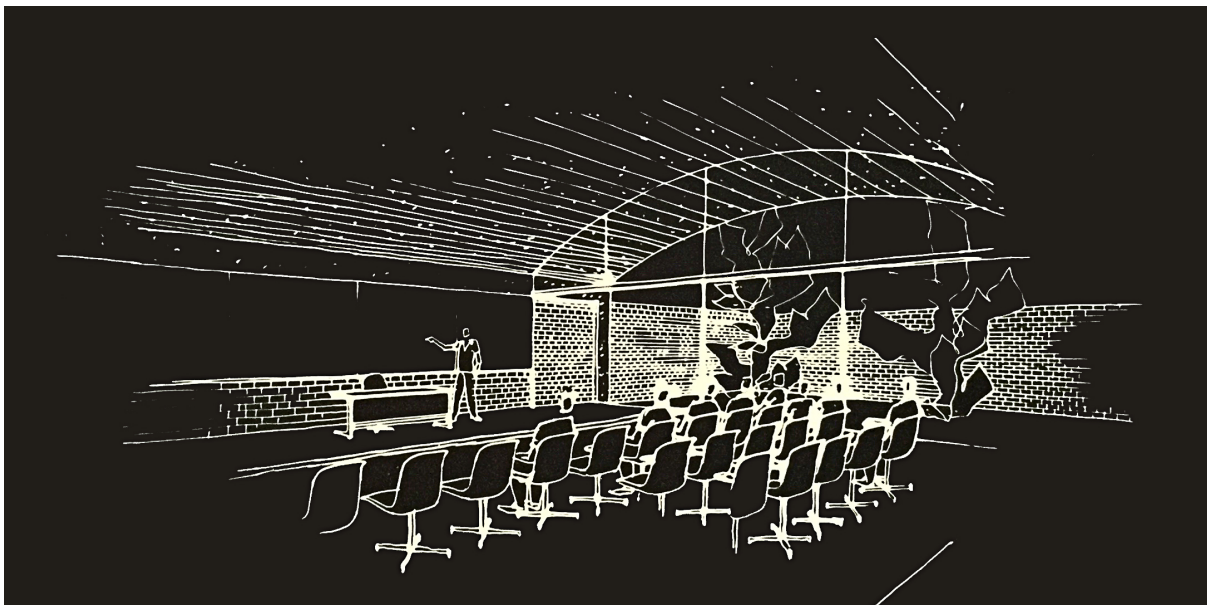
DASP Training Center built with concrete shell ceilings, Brasília, 1973-77. Design and drawing by Lelé. Arquivo João Filgueiras Lima, Salvador
